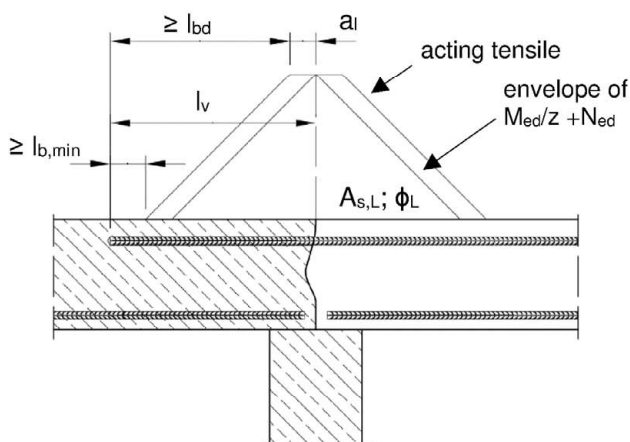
Overlapping joint for rebar connections of slabs and beams
